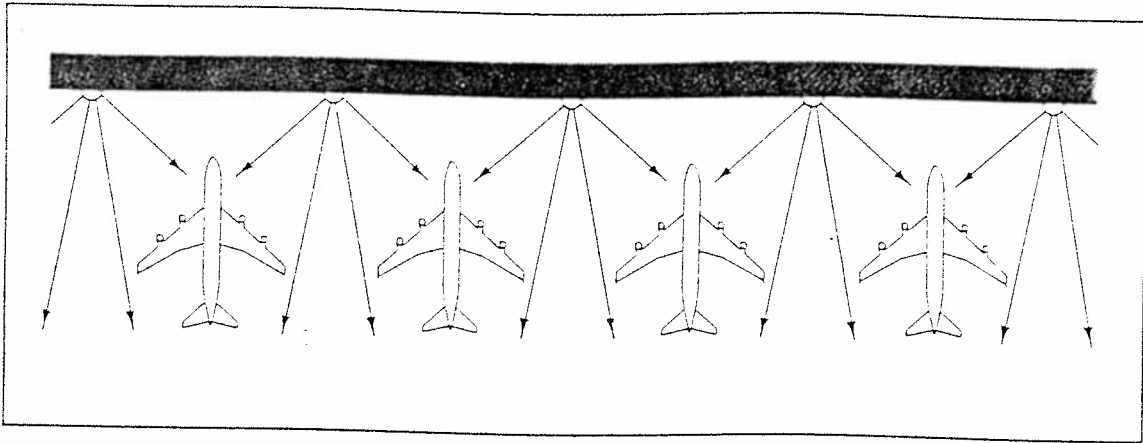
Typical floodlight arrangement and aiming for nose-in parking
